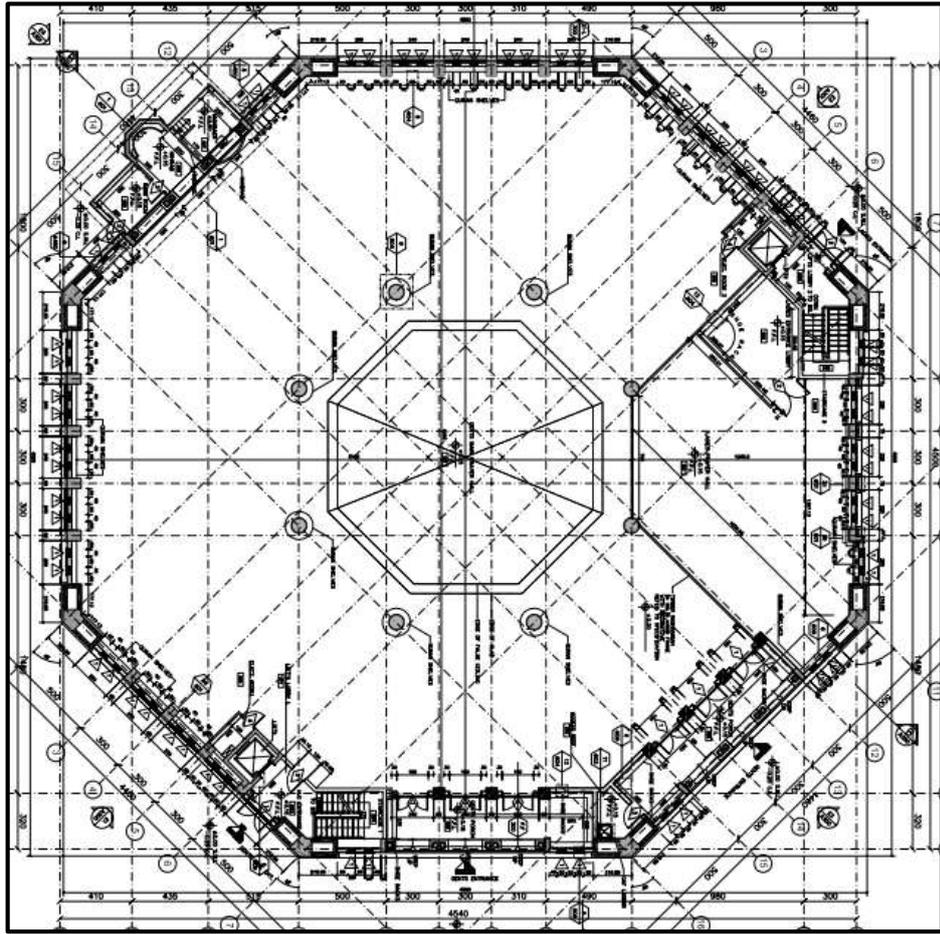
architectural floor plan of the mosque (Author 2021)
